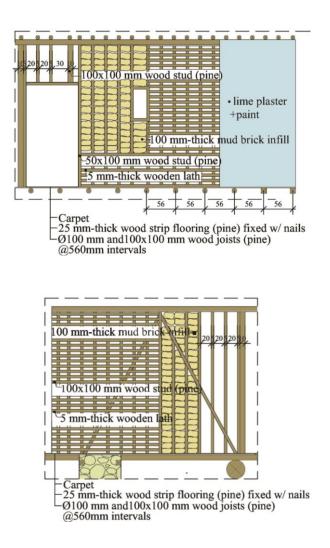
Elevations of Original-Wall 4 & sections of Original-Floor 4 in 1/50 scale (Drawn by author).
